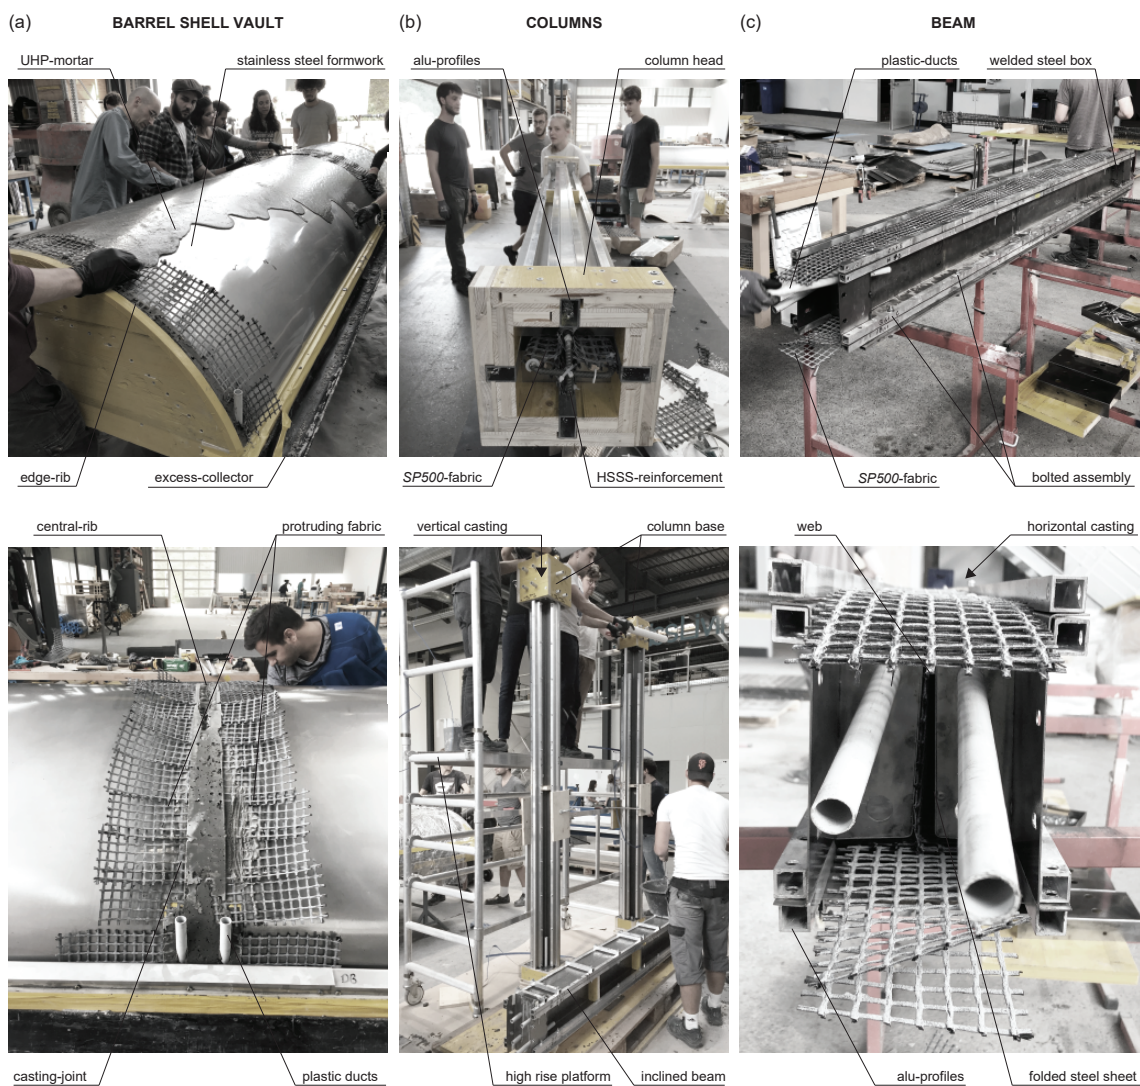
Casting procedure and formworks of: (a) barrel-shaped shell; (b) columns, and (c) foundation-frame beams.
